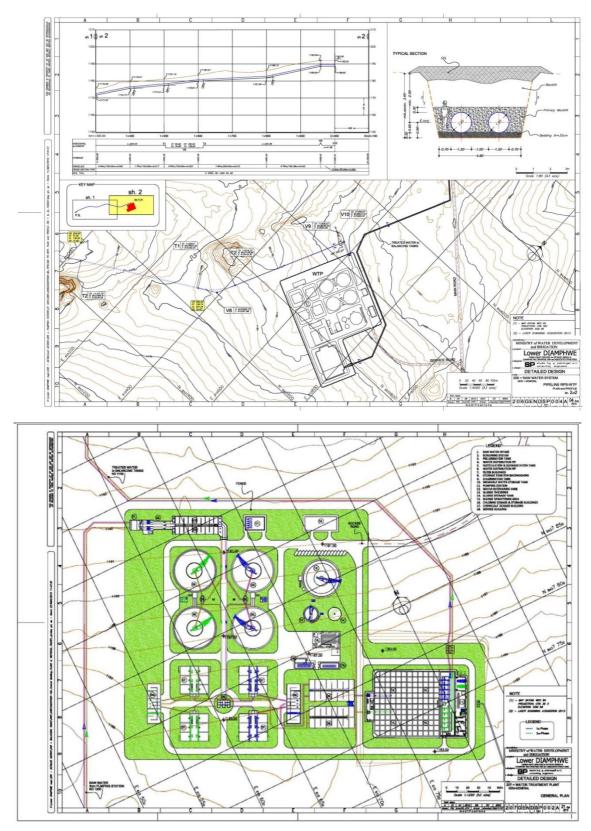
Water Treatment Plant Layout (Ref. SP 2015)
